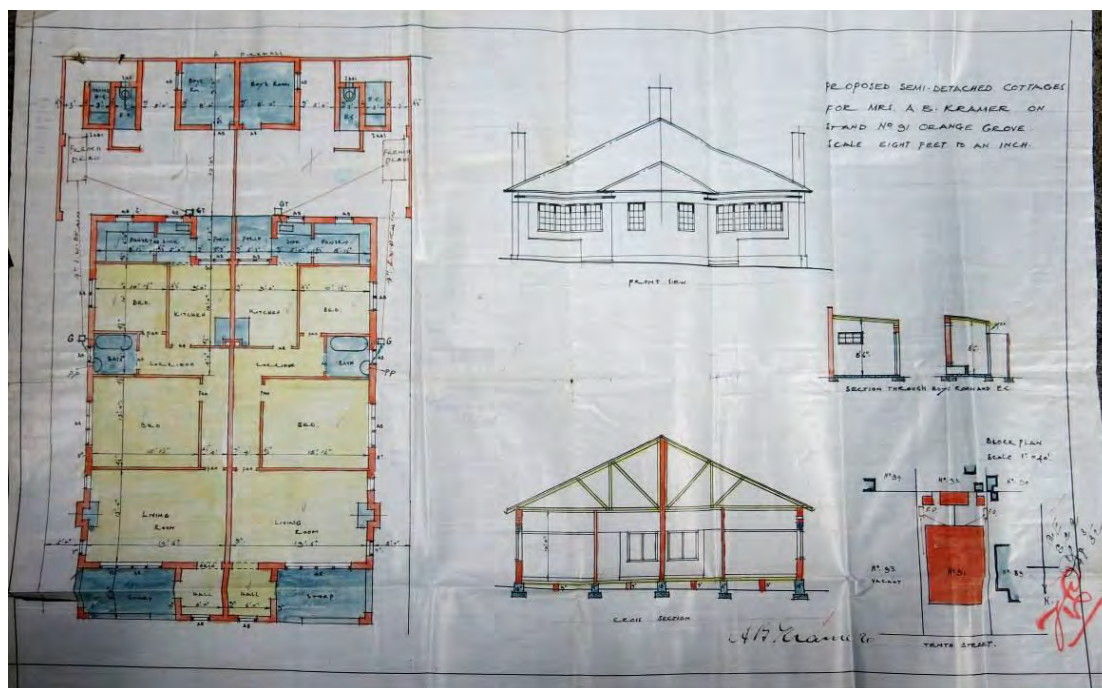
Plan for proposed semi-detached cottages, Stand 91
